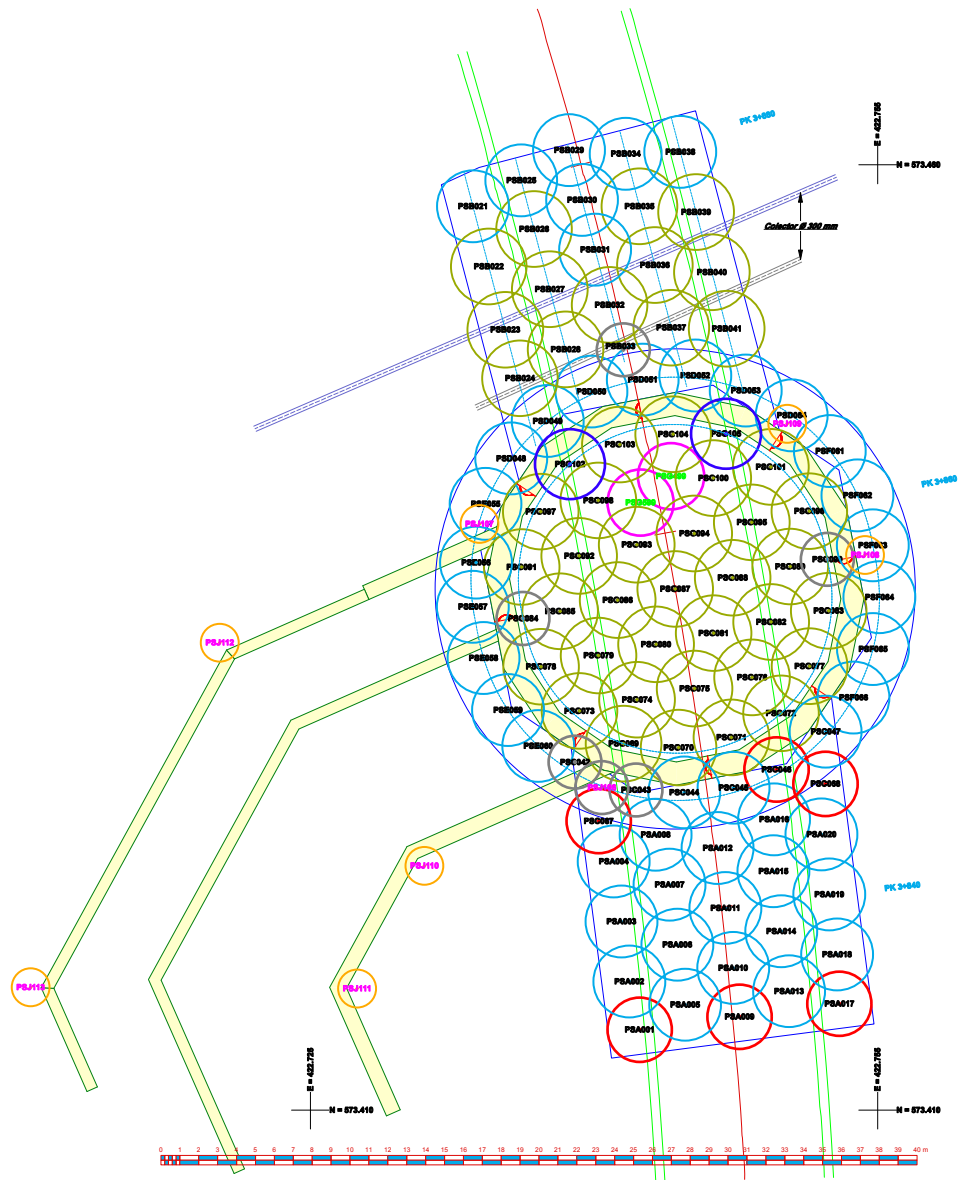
Drawing of treatments (bottom buffer, break-ins and break-outs) at shaft 6.
